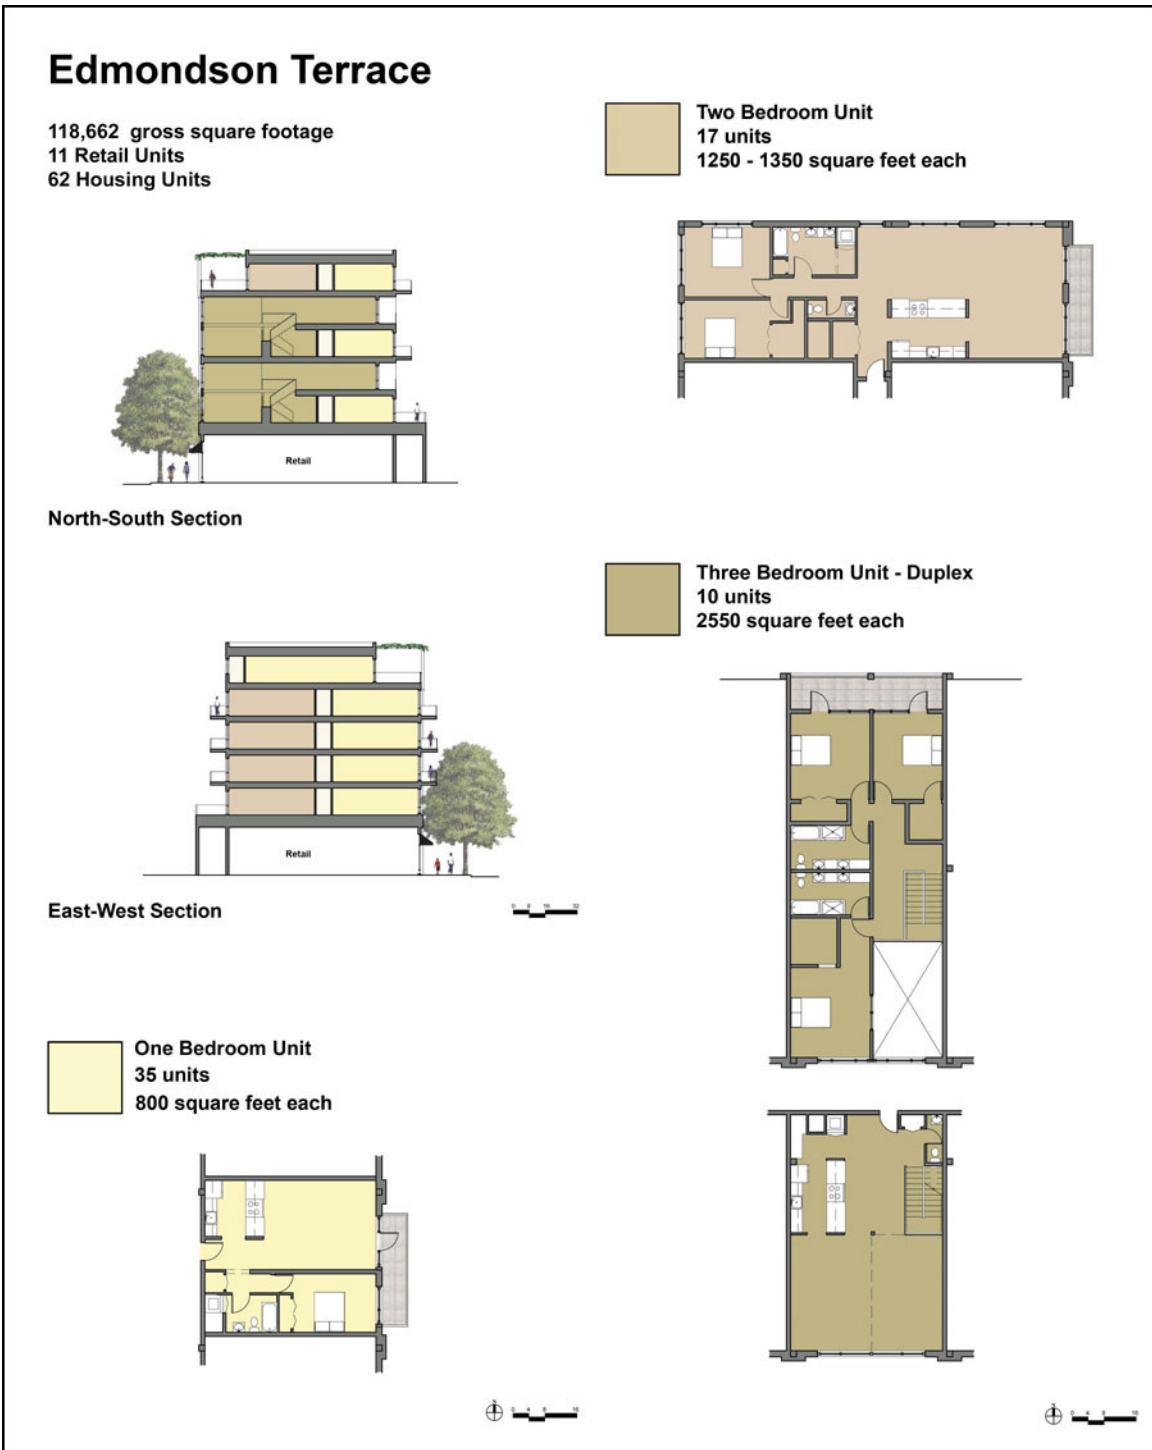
Typical Unit Plans for Housing on Edmondson Avenue
